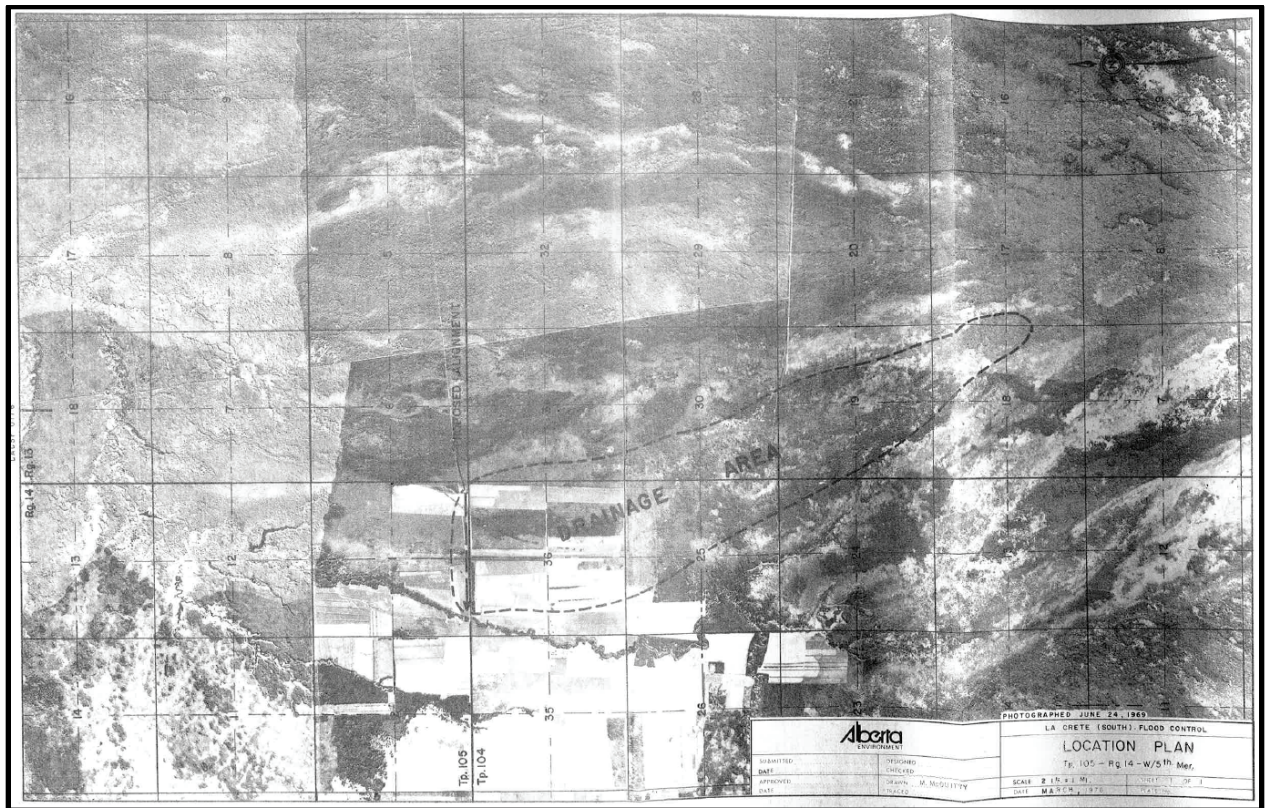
Drainage alignment proposed for the La Crete (South) drainage ditch (by Alberta Environment)
